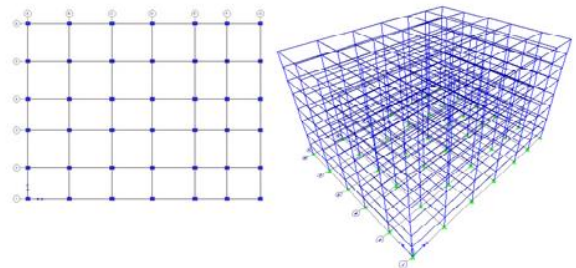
Plan and 3D view of Conventional RC Framed Building
